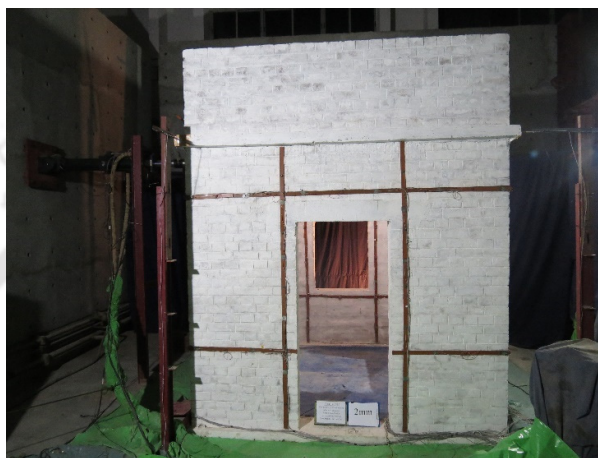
Experimental setup of strengthened URM building specimen (Model 2).
